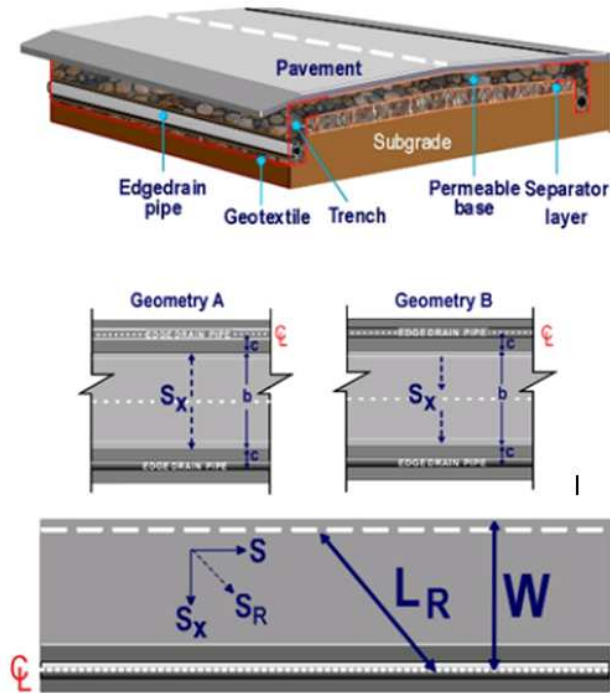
Roadway geometry used in drainage design calculation on MEPDG
